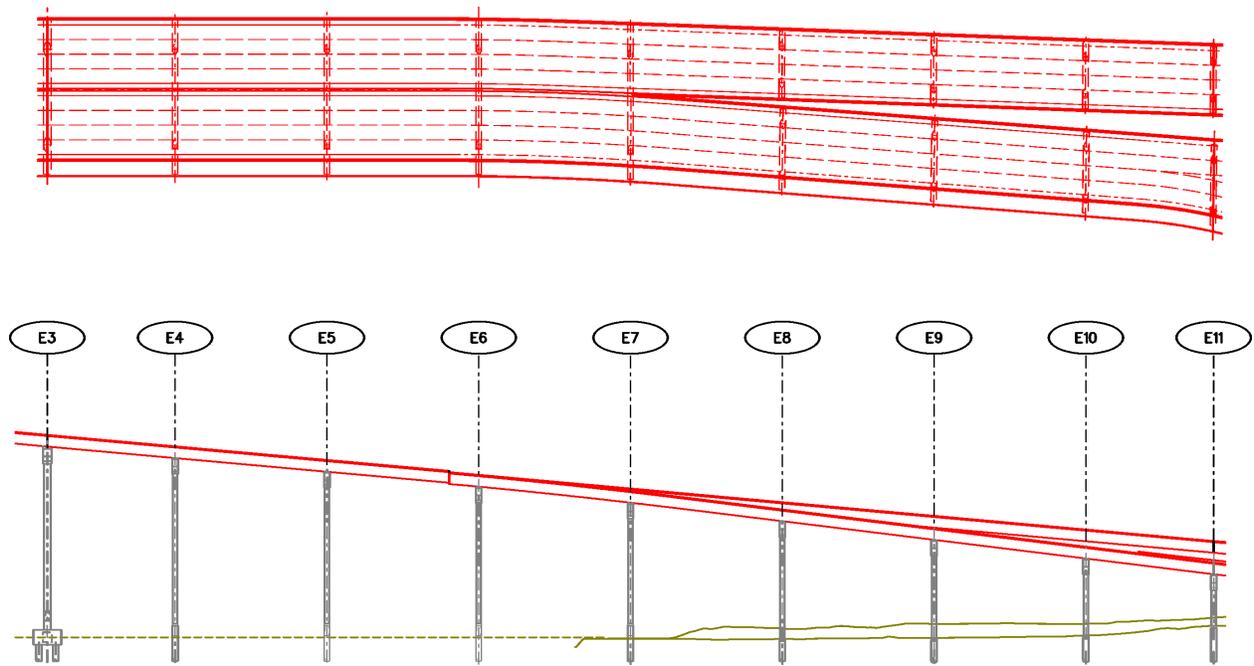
General Arrangement of Mt. Pleasant High Level Approach
